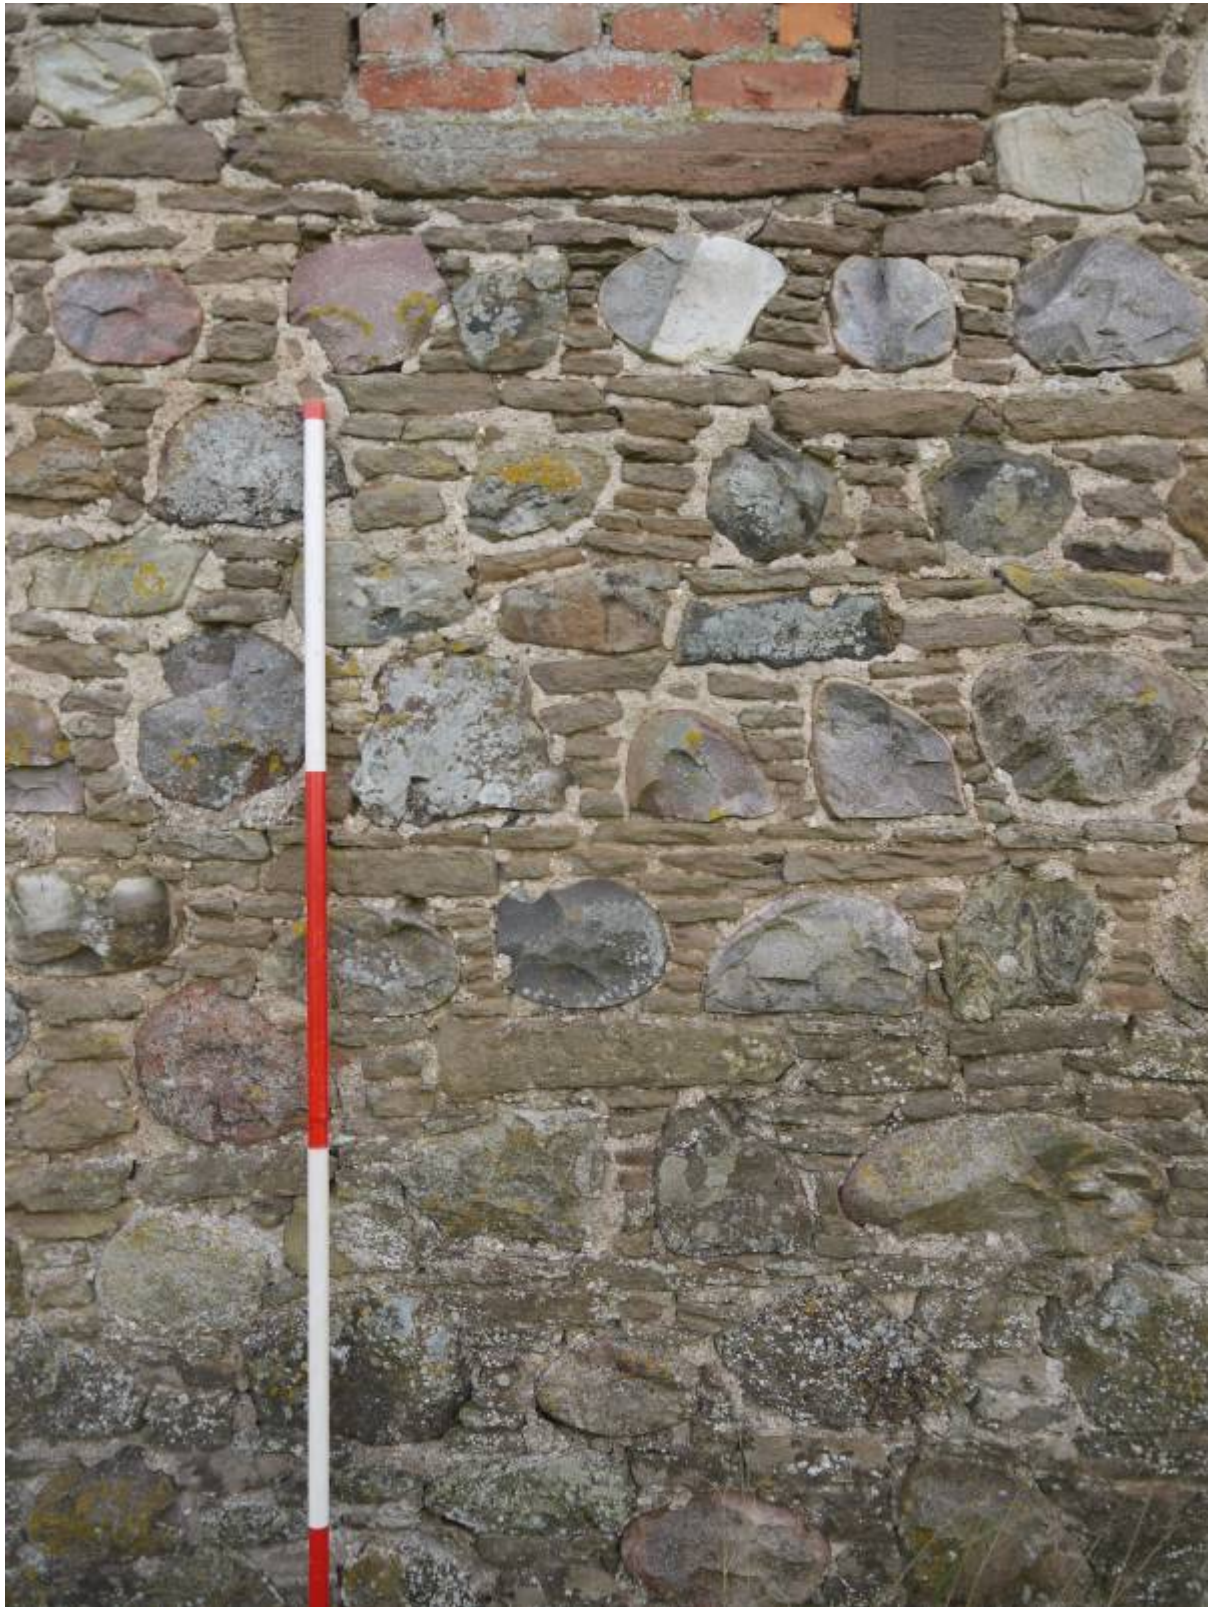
Detail of stonework in West facing elevation of Structure 2, bottom of blocked window just visible at top of shot
